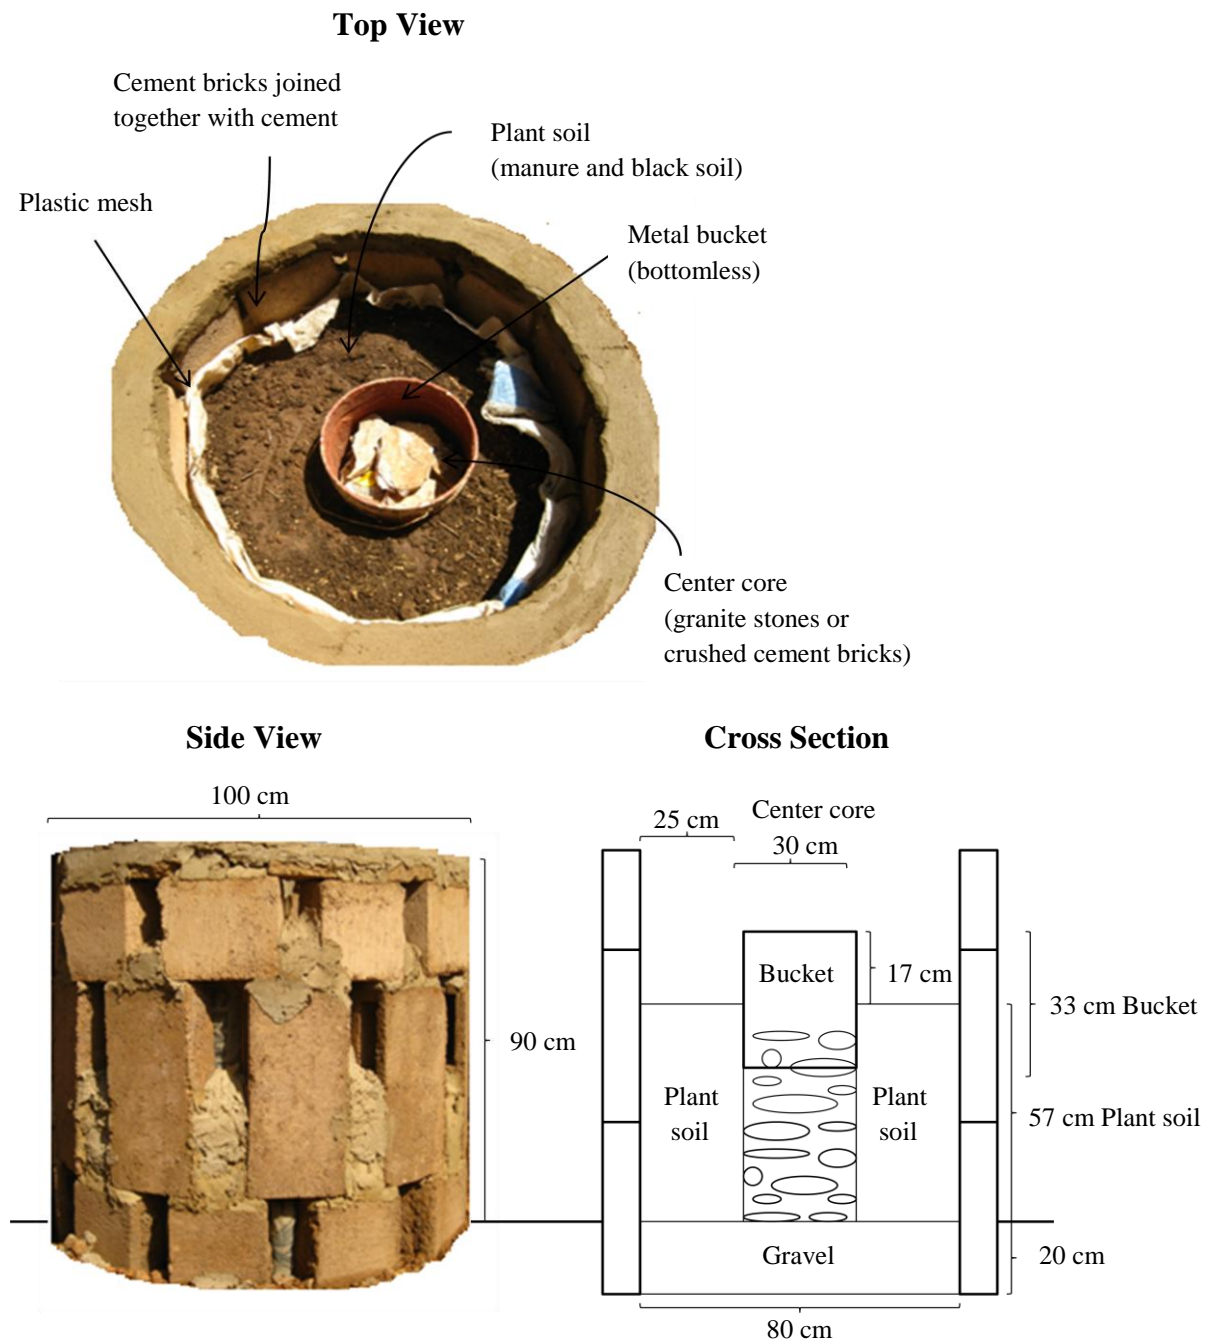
Top view, side view and cross section of a vertical garden. Standard measurements are given (author's figure).
